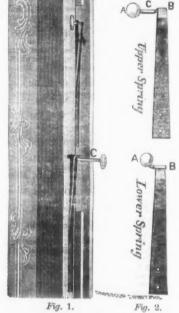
is a side view of the window frame and spring. Fig. 2 shows upper and lower springs. A is the thumb piece, B the shoulder and C the neck of the spring. The thumb piece of the spring, seen in Fig. 2, is a shell neatly plated and placed upon the neck, which extends nearly The whole is filled with solder, which fills the thumb plece, while making it perfectly secure upon the neck. Fig. 3 shows the upper sash dropped down almost to the lower end of the upper spring. The parting bead is removed to show the position of this spring. A part of the front bead is also removed to show the position of the shoulder
